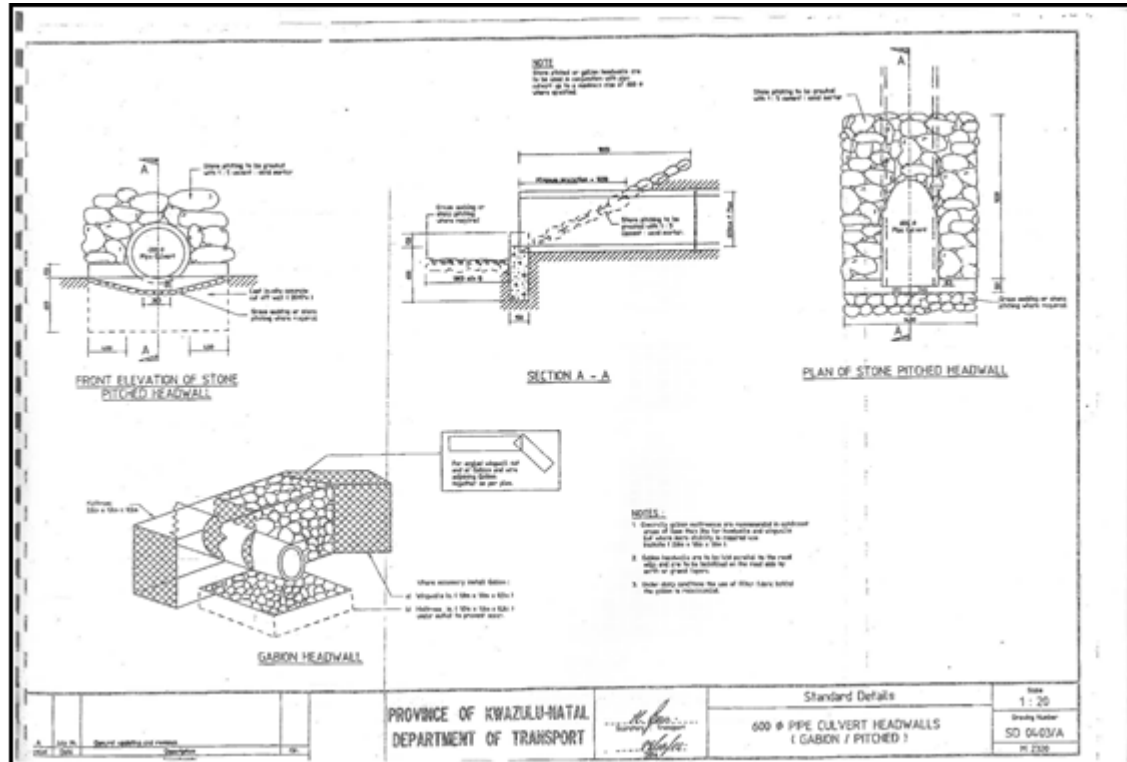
showing the standard details for the pipe culverts (Drawing no. SD0403/A)
